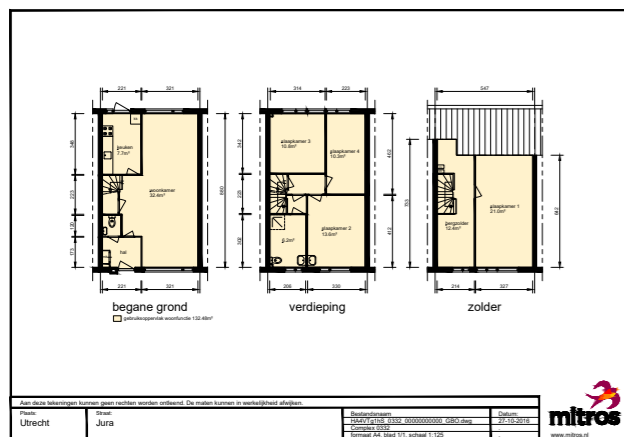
Floorplans of case study building, provided by housing company Mitros (2016)
